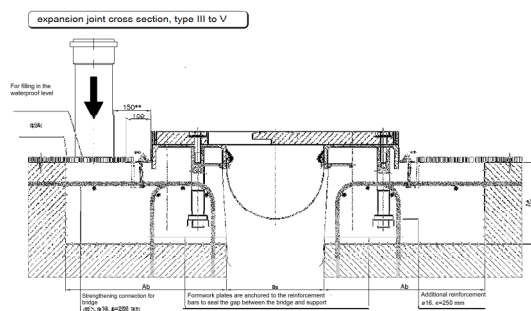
Cantilever expansion joints - principle of installation with a funnel
